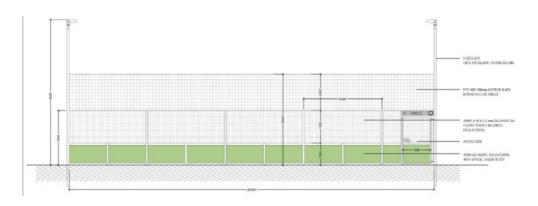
Pitch enclosures with kick-board, netting and floodlight columns
